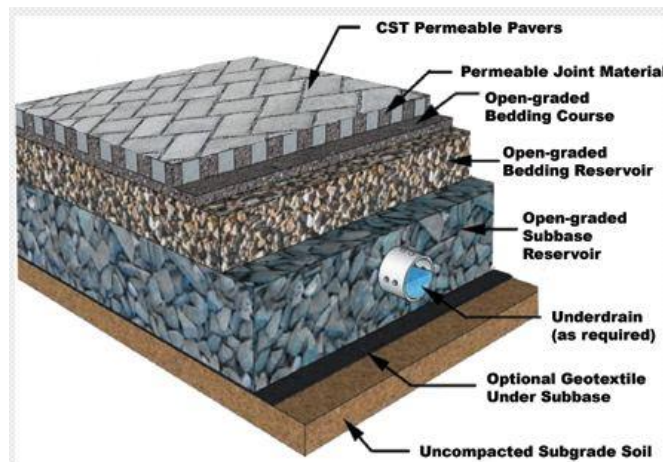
Representation of a permeable paving system (Concrete Stone and Tile Corp 2013)
